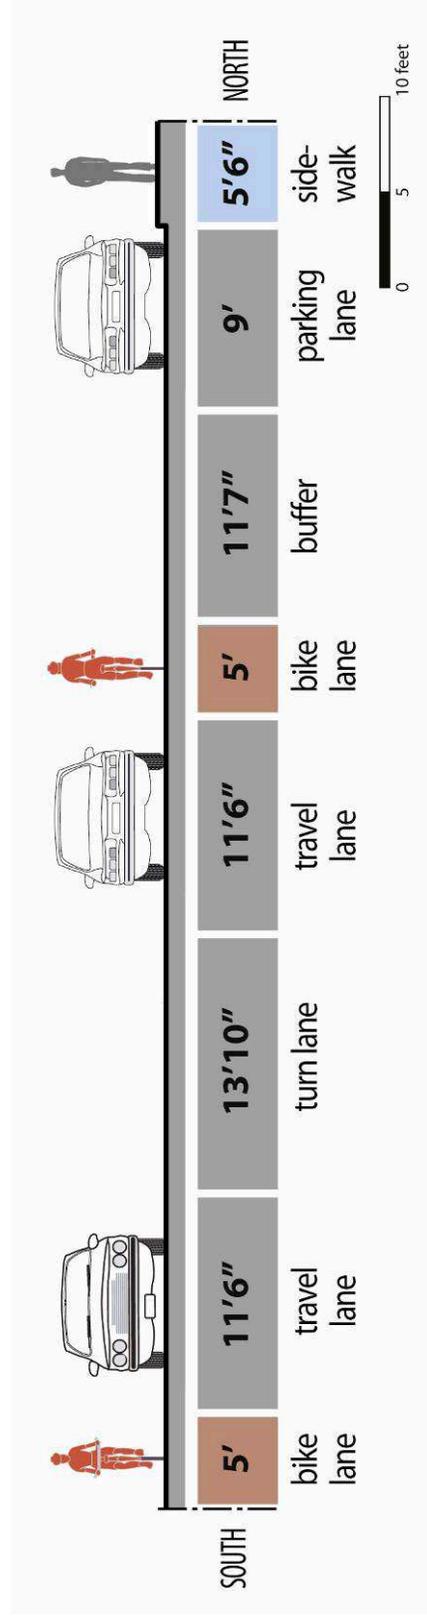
Section of Proposed Improvements for Project 1: SFD at Olema Road (west)
